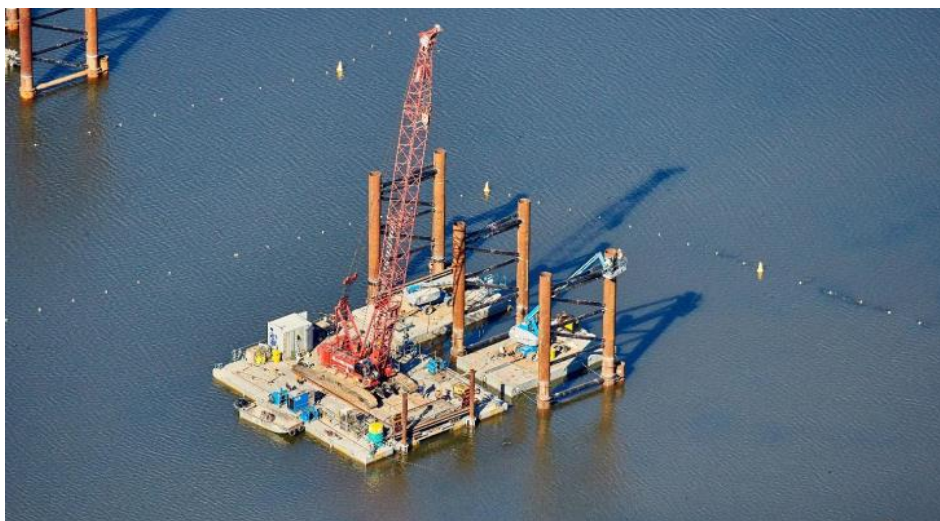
Example of crane on barge driving pile / installing temporary headstock
